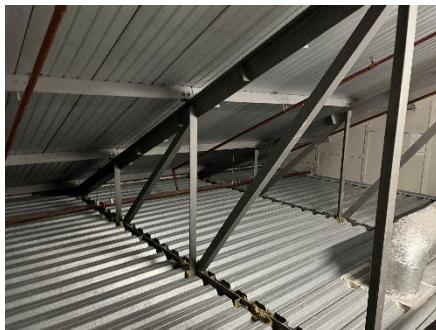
View of roof void above first floor suspended ceiling accessed via steel ladder
